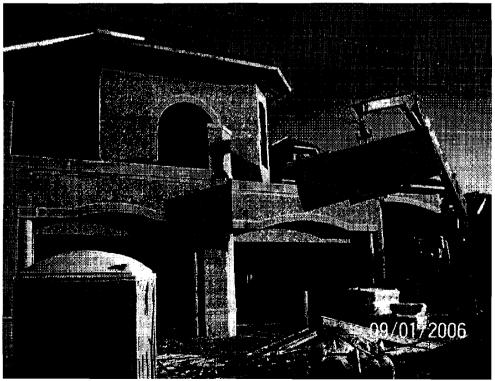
Photograph of drywall being delivered to the consumer's home on 9/1/2006.
